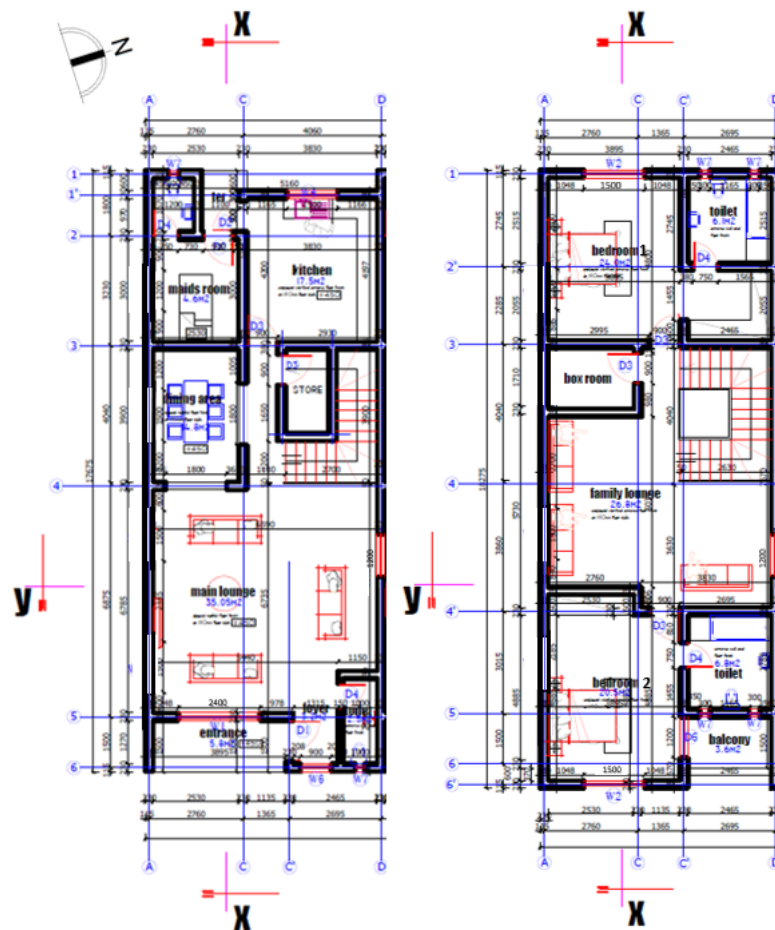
Ground Floor Plan (to the left) And First Floor Plan (to the right) of a Terrace Unit in Case Study One (Ivy Homes)
